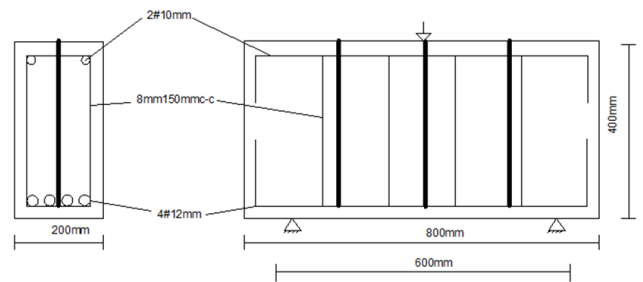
Schematic diagram :Cross-section and Longitudinal section of beams EB6-8-3
